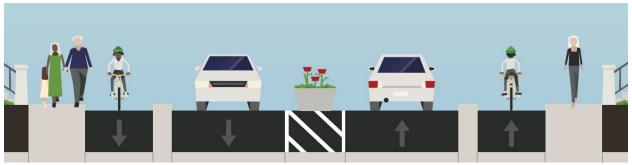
Future cross section Superior Avenue after installation of cycle tracks and new median.
